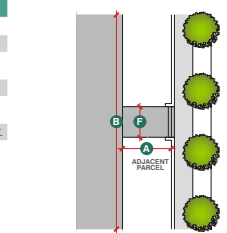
DOORYARD FRONTAGE PLAN DIAGRAM
